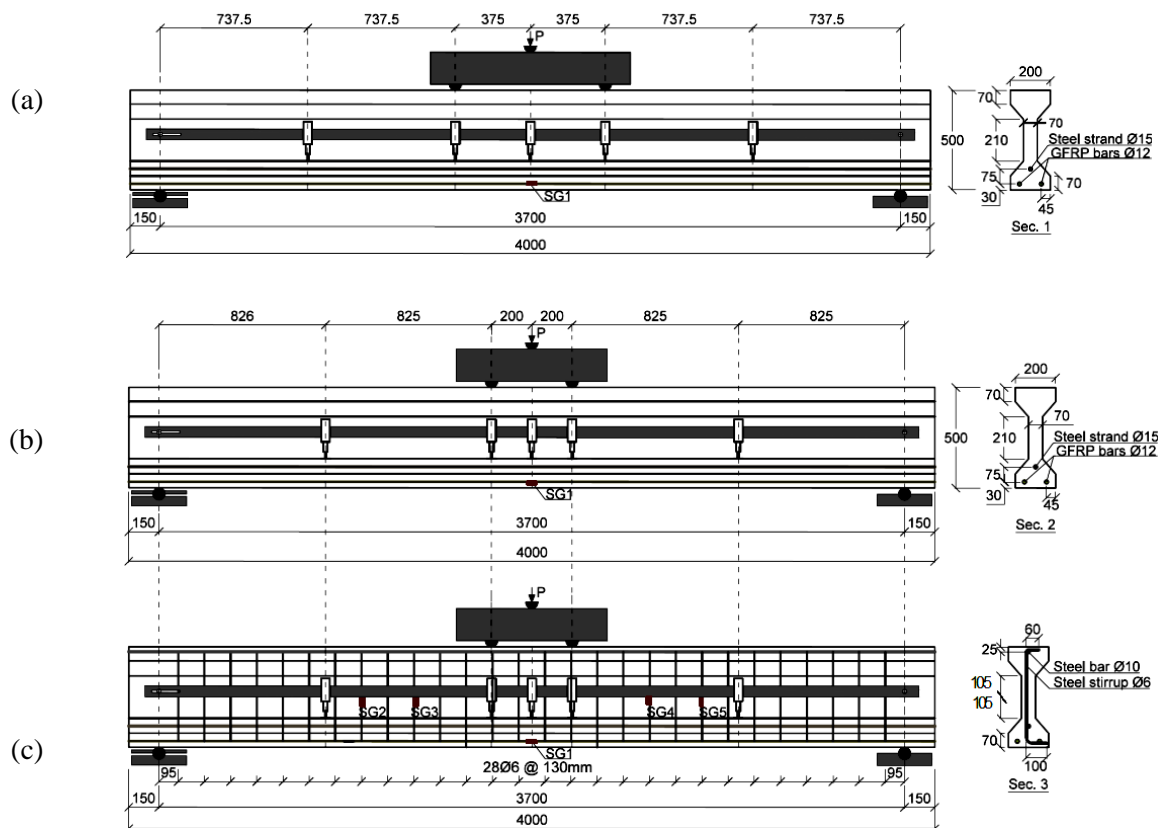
Geometry, reinforcement and test setup of the beams of (a) group 1 (G1-F1.1-S0; G1-F1.1-S23; G1-F1.1-S46), (b) group 2 except G2-F0-ST, (c) G2-F0-ST (dimensions in mm) (Soltanzadeh et al., 2016b).
